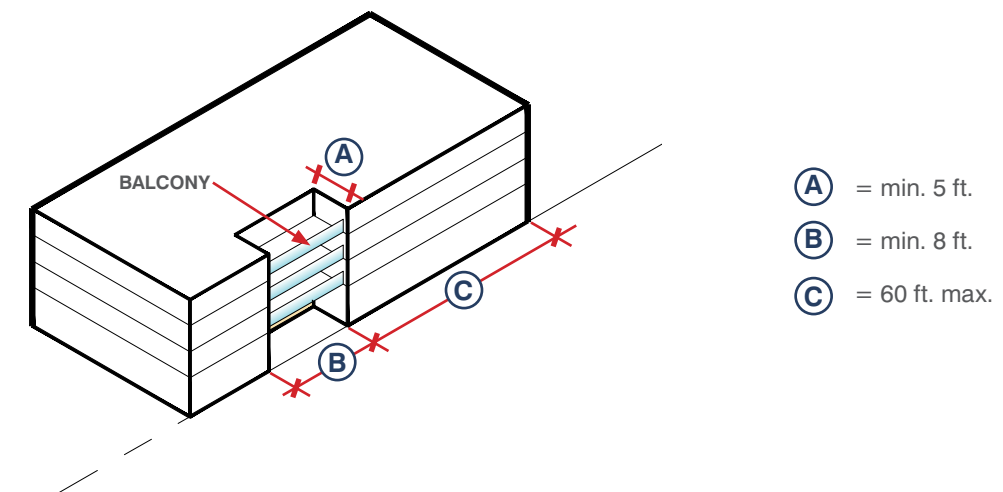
MAXIMUM CONTINUOUS UNINTERRUPTED BUILDING LENGTH
